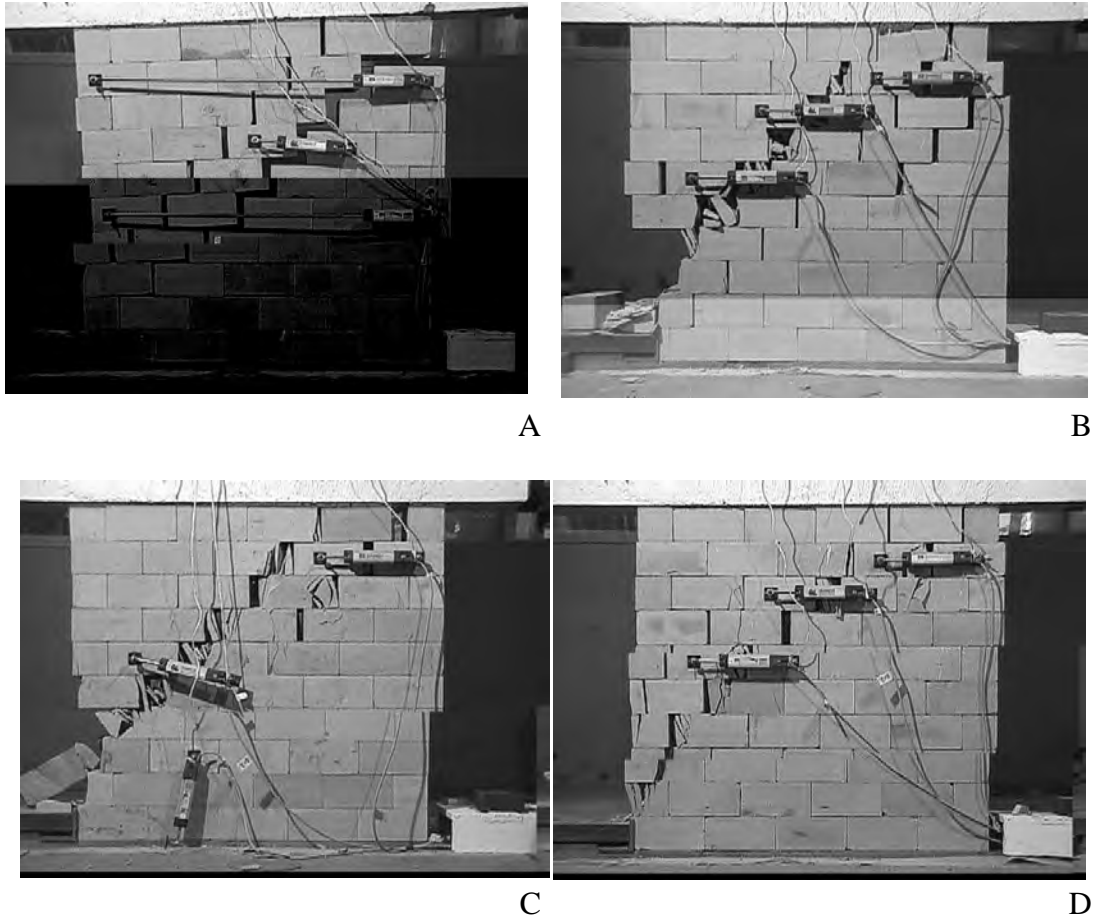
Aspect of walls at failure (A-SW30.1, B-SW100.1, C-SW200.1, D-SW250.1).
